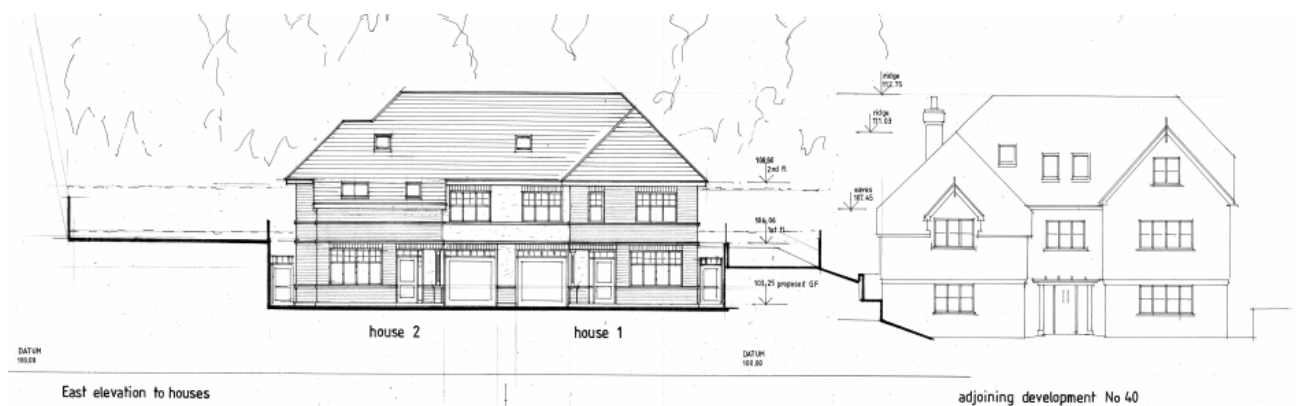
Proposed Front Elevation (rear semi-detached houses) in context
